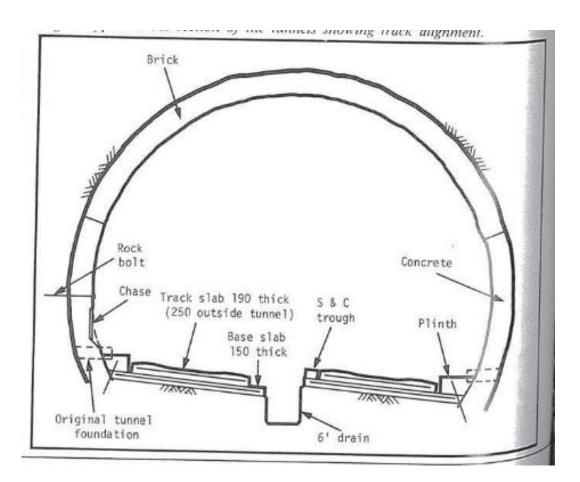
Section showing upgrade works to tunnels including lowering works, 1980 (Source: Duncan, S.D. 'Paved track for Australia's Blue Mountains Zig Zag tunnels' *Tunnels & Tunnelling*, May 1980, p32)
